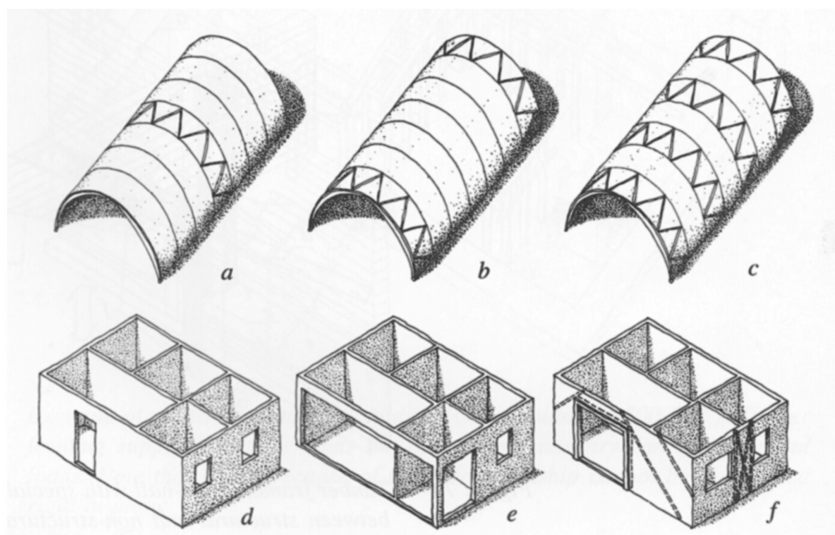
Schematic examples of distribution of bracing and stiffening. (a) and (e): poor; (b) and (f): fair; (c) and (d): good.
